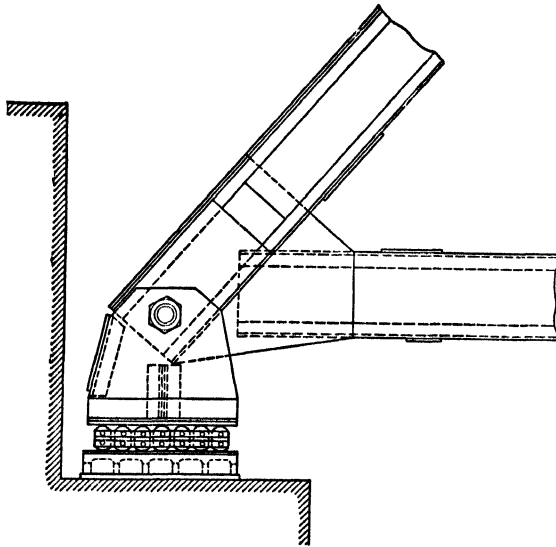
Typical Bridge-Truss Shoe with Rollers.
